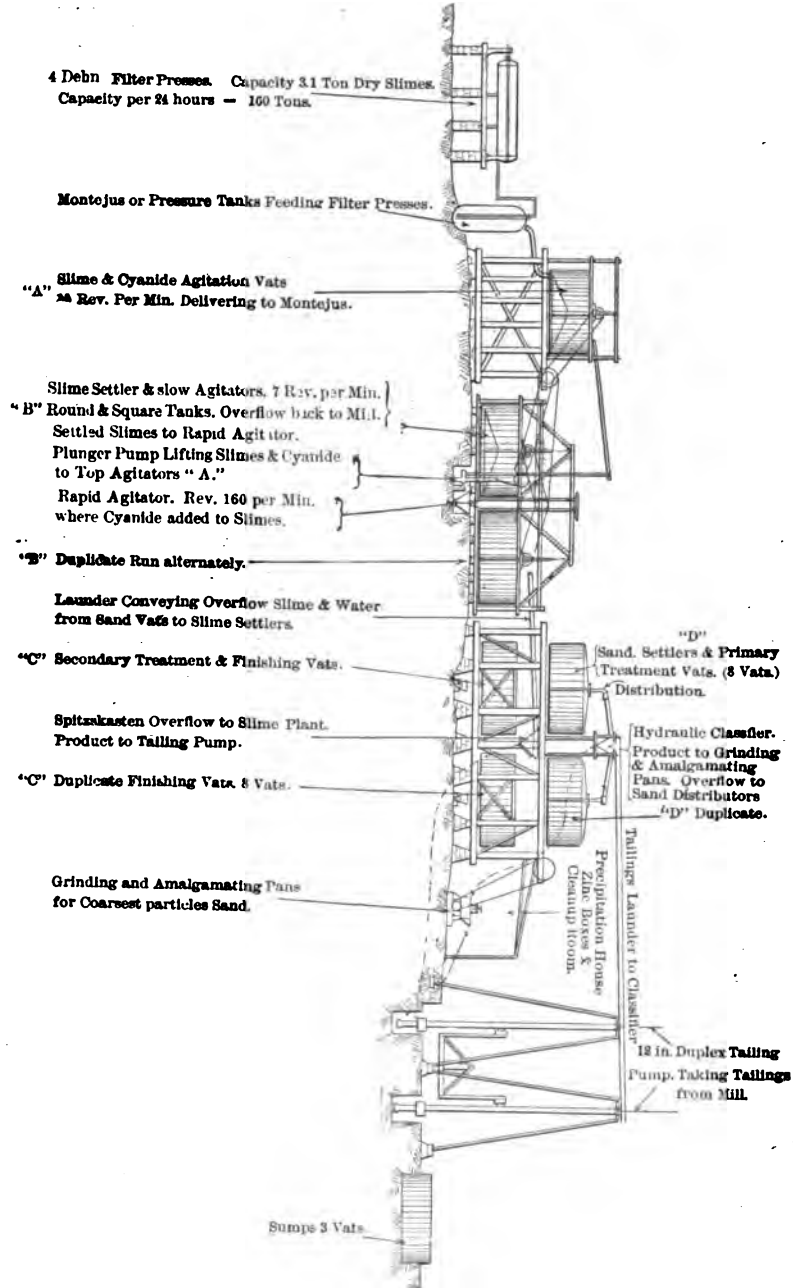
THE IVANHOE TREATMENT PLANT (ELEVATION).
